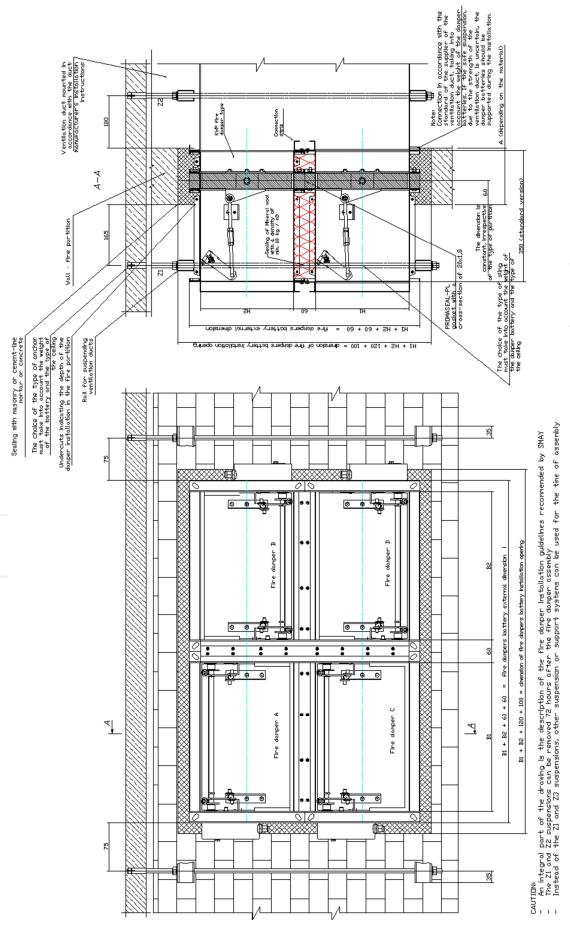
Installation of a battery consisting of four fire dampers KWP-O-Ex in wall
